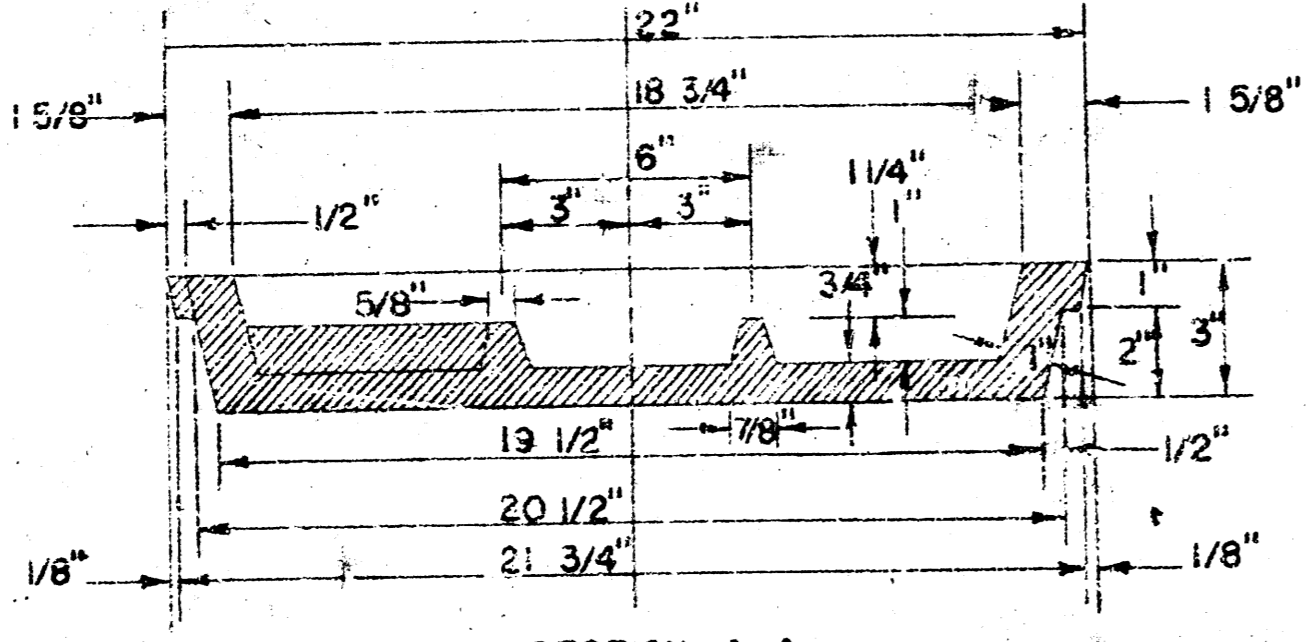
DETAIL OF DROP STACK FOR EXISTING MANHOLES IN GROUND WATER
